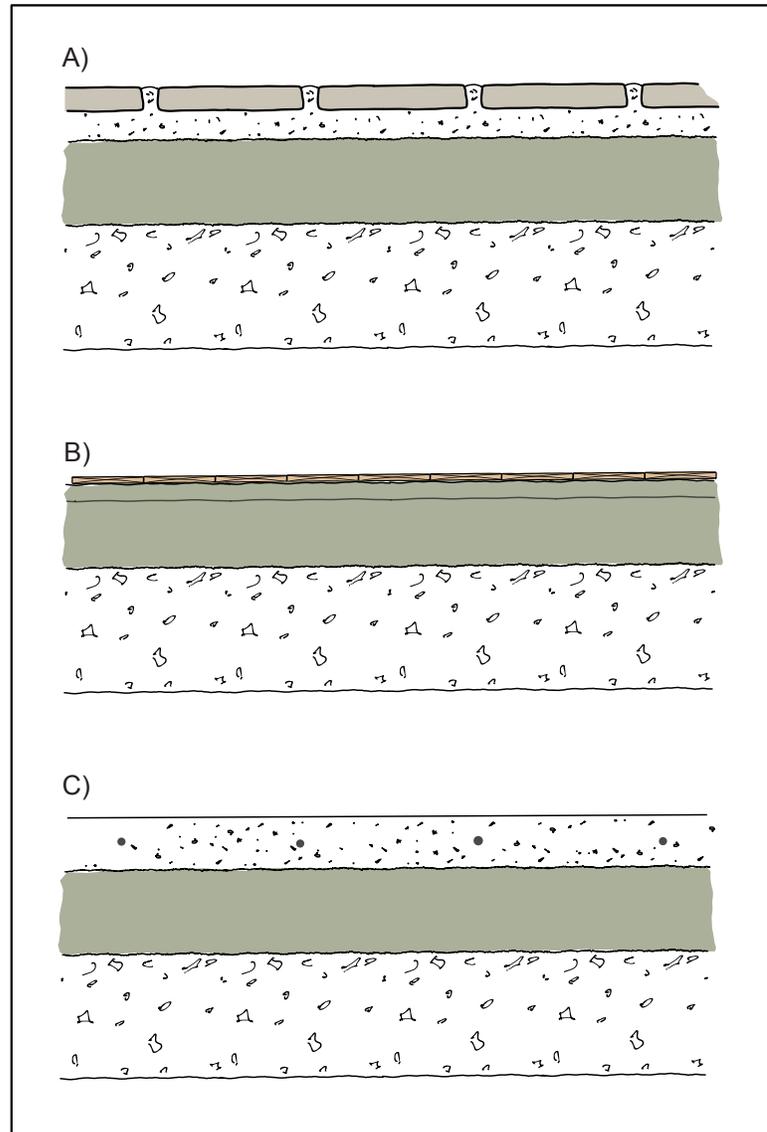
Three different types of floor finish. A) Limestone slabs, lime mortar bed with in-floor heating, lime-rich hempcrete slab, free drainage aggregate, undisturbed soil. B) Rough sawn wood planks, 2x4 embedded, lime-rich hempcrete slab, free drainage aggregate, undisturbed soil. C) Polished lime floor slab with in-floor heating, lime-rich hempcrete slab, free drainage aggregate, undisturbed soil.
